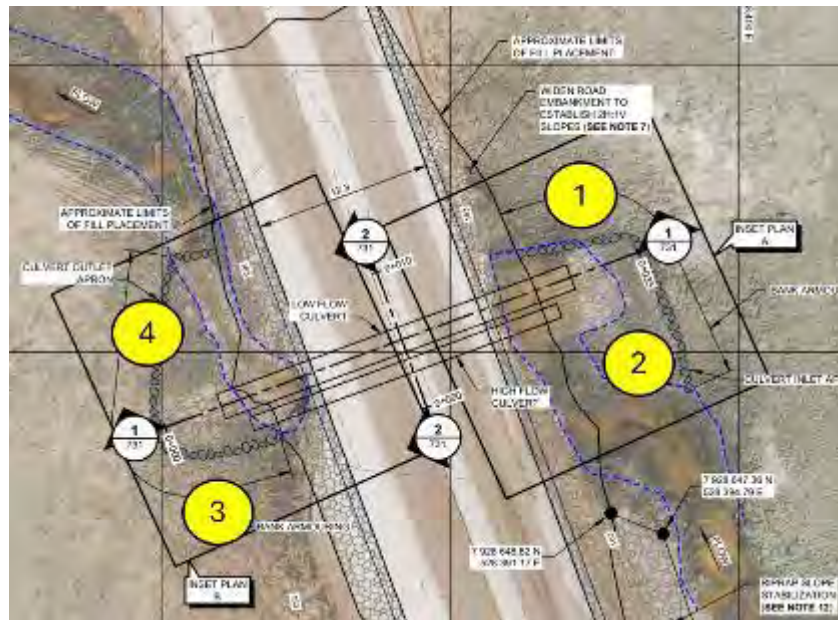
Culvert Crossing CV-057 - Photographic vantage points (Approximate locations, indicated with yellow circles).
